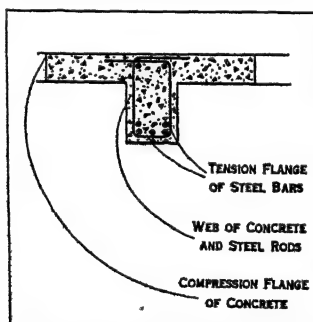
CROSS-SECTION OF CONCRETE BEAM INTEGRAL WITH FLOOR SLAB
